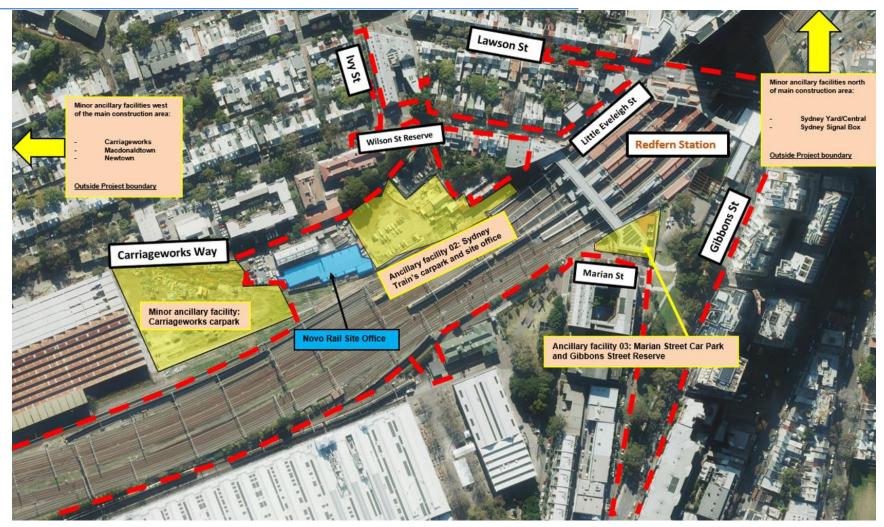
Site layout plan – ancillary work locations/laydown areas and rail corridor access points
